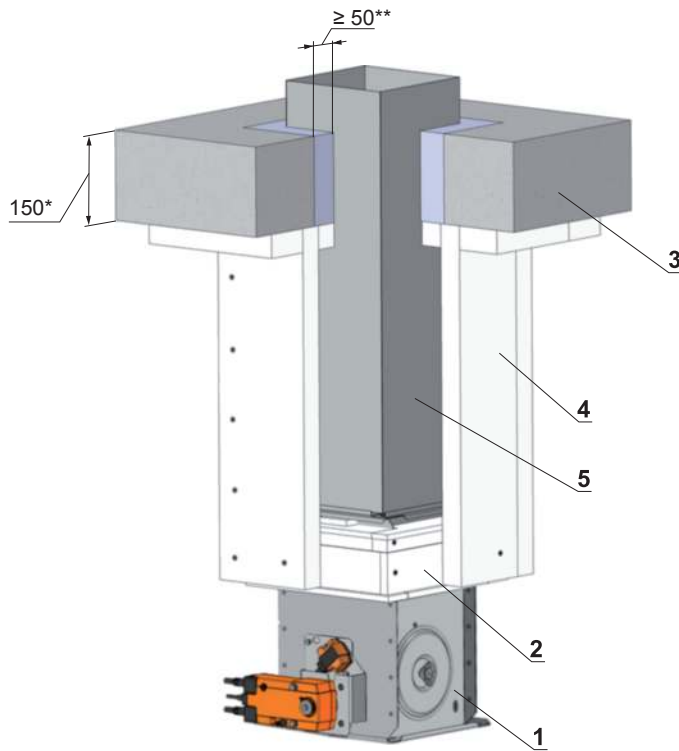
Installation outside of solid ceiling construction - installation frame with cement lime plates
